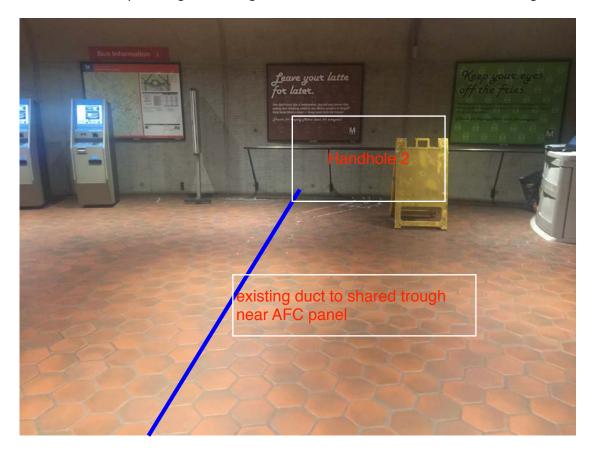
G02 Capitol Heights: Proposed run transition to conduit along hallway of backrooms towards AFC panel
